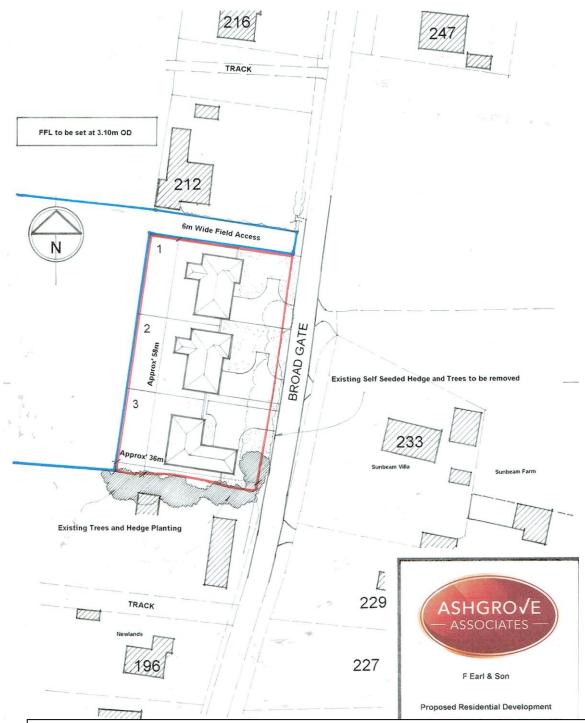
Block plan showing the proposed layout of the development site at an original scale of scale 1:500 at A3, (extract from Architects plan).
